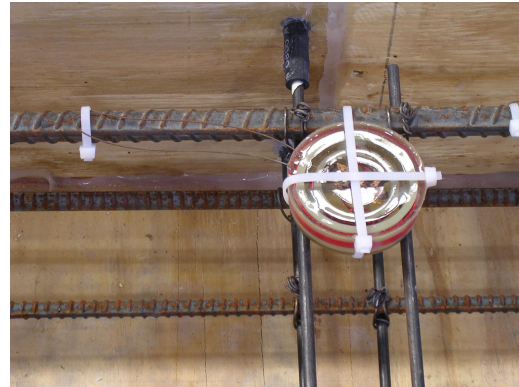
Steel sensing wires were connected to the top layer of reinforcement in Slabs 3 and 4.
